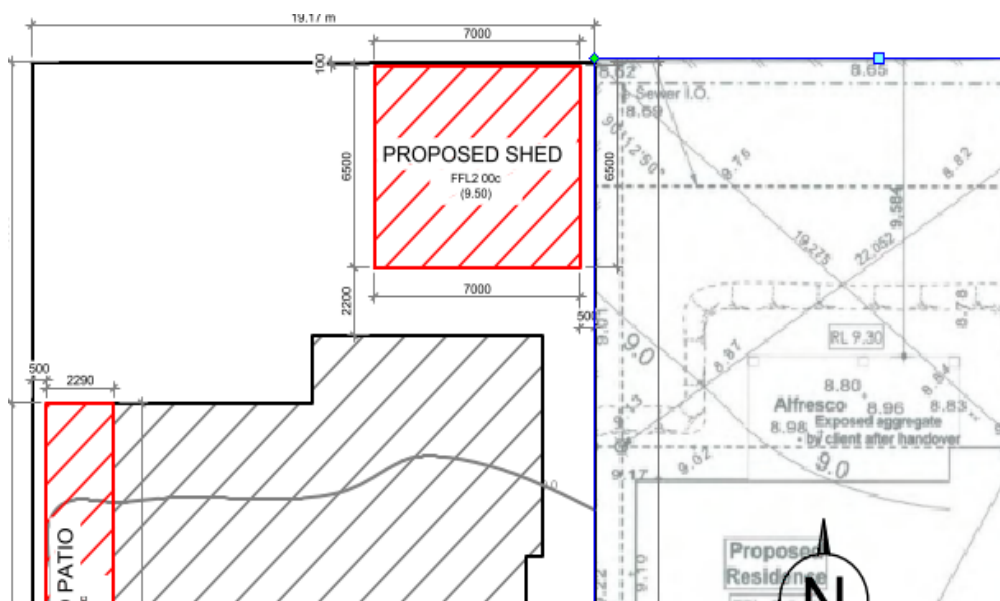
Image of the proposed outbuilding on the subject lot (left) in relation to the approved site plan for 15 Widdicombe Street (right). The proposed outbuilding abuts uncovered open space, and the alfresco area/primary outdoor living area of the adjoining site is located centrally, away from the proposed outbuilding.
